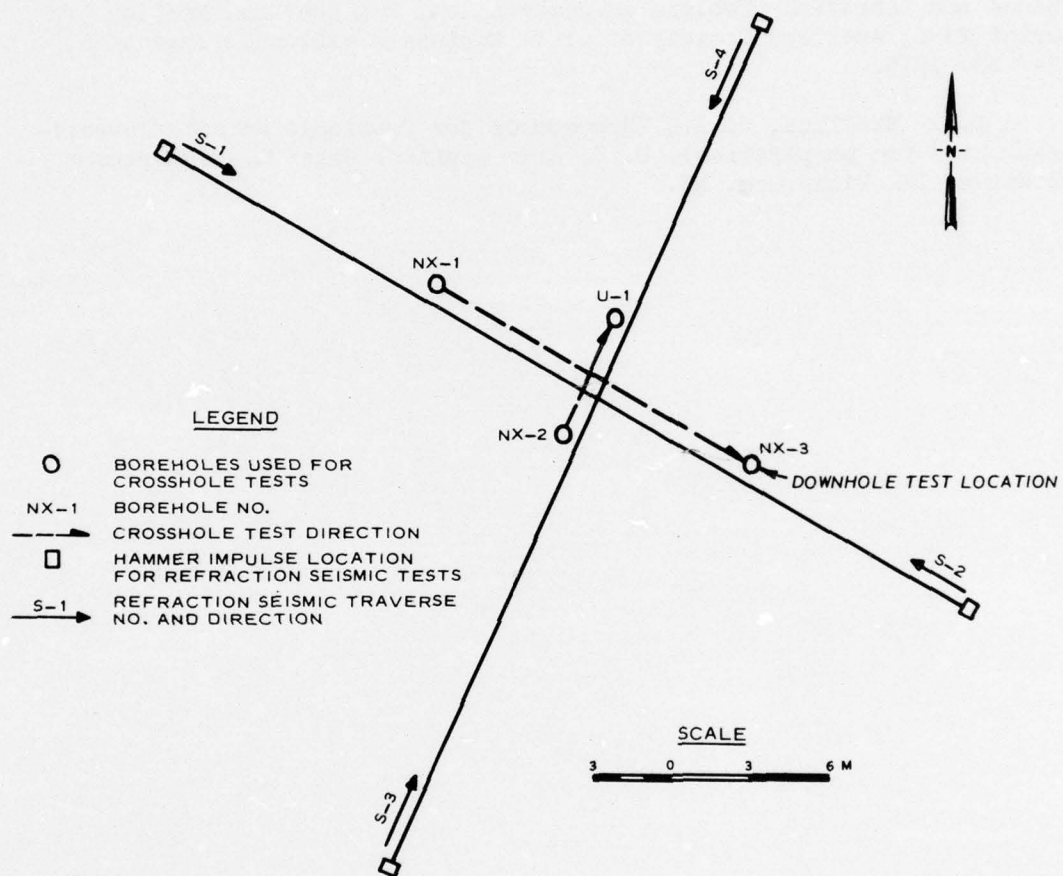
Plan view showing crosshole, downhole, and surface refraction seismic test layouts.
